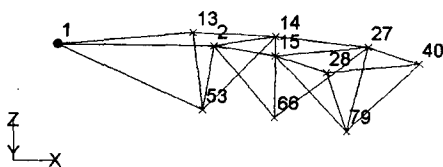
Basic Structural Unit of Dome Shaped Space Truss
